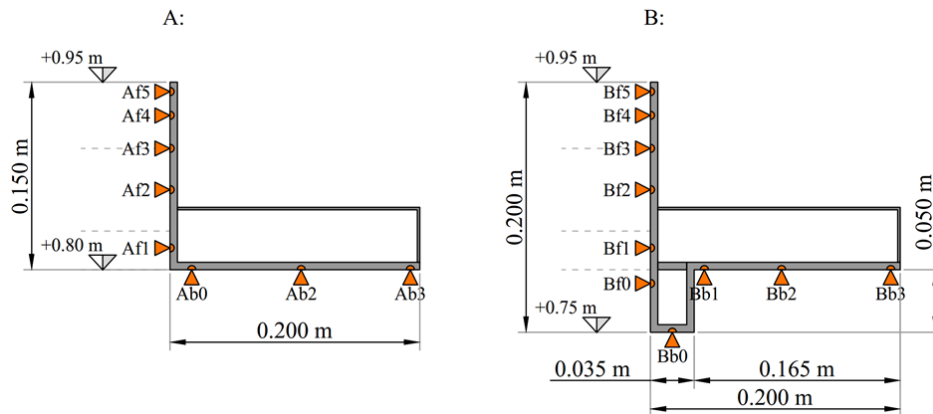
Tested crest wall cross-sections and location of the pressure transducers [5].
